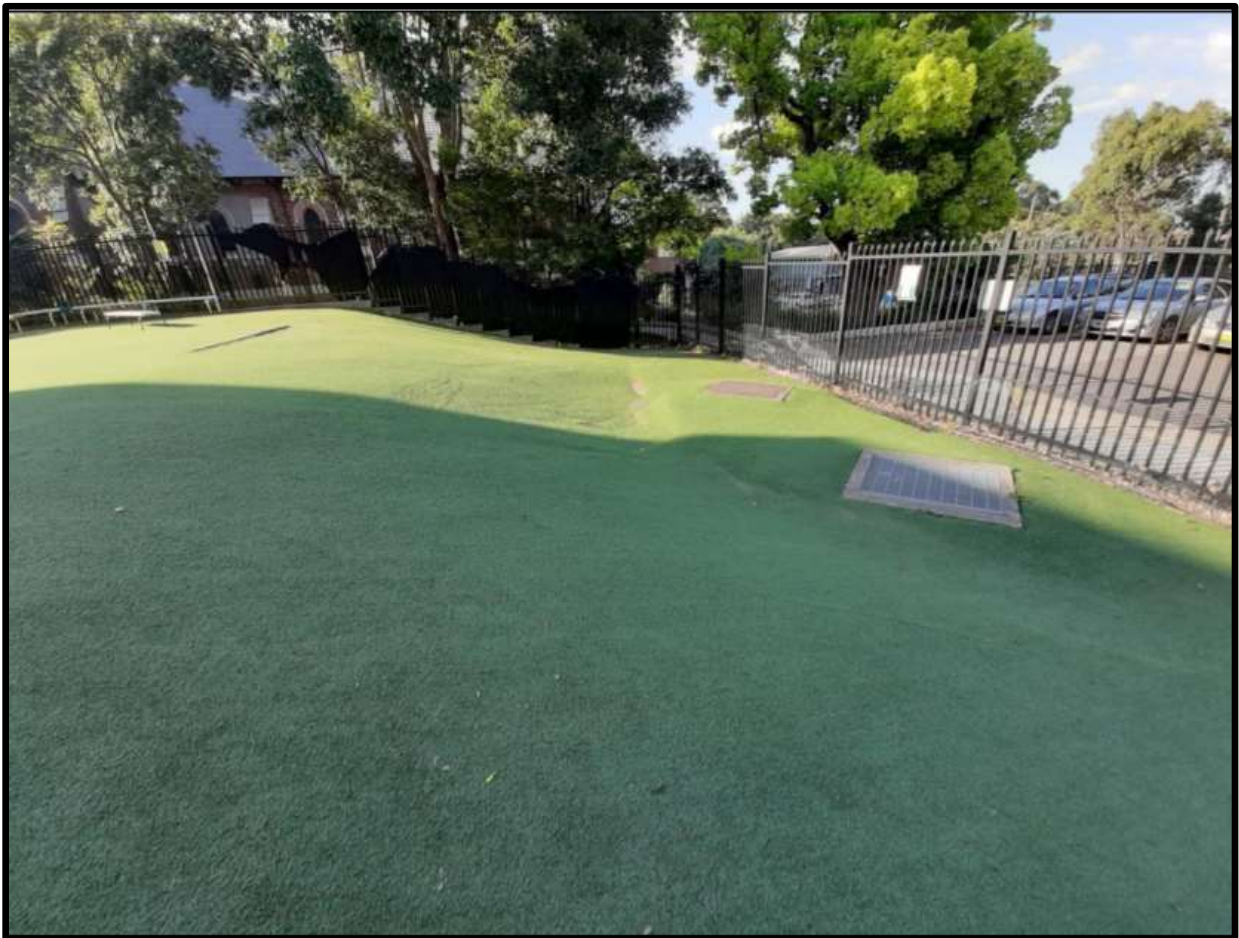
The subject site and existing trees to the north which will be retained as part of the proposal (courtesy: Resolve Planning, 2020)
